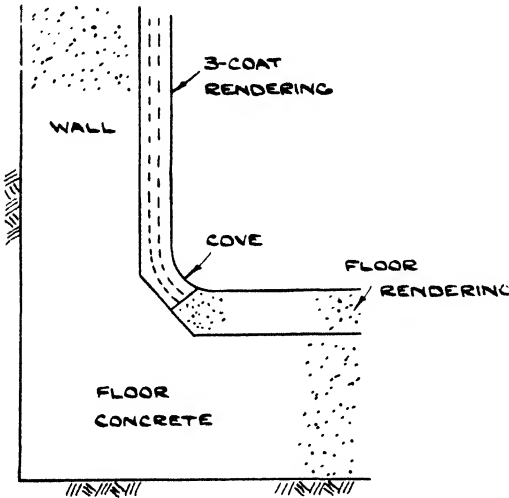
WATERPROOFING AT ANGLE OF FLOOR AND WALL AGAINST INFILTRATION AT BASE OF WALL RENDERING
